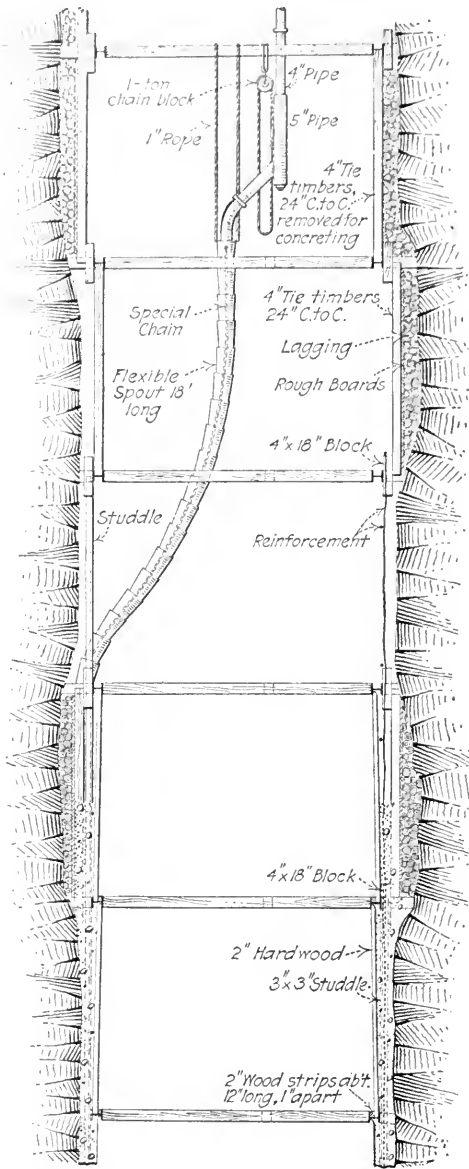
VERTICAL SECTION OF SHAFT, SHOWING SETS AND FORMS AND FLEXIBLE SPOUT.
